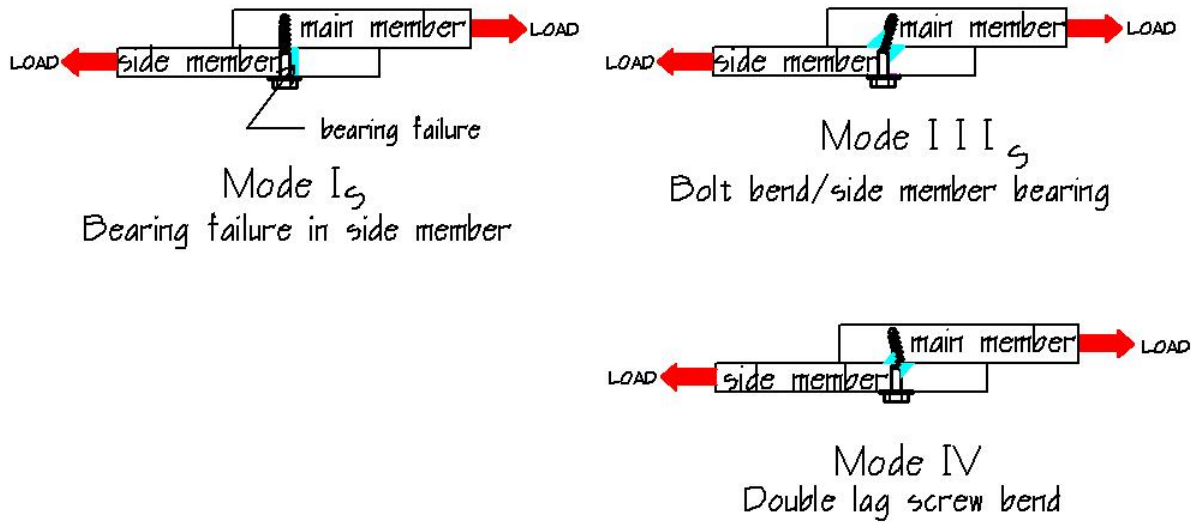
Lag Screw (Single Shear) Joint Failure Modes
